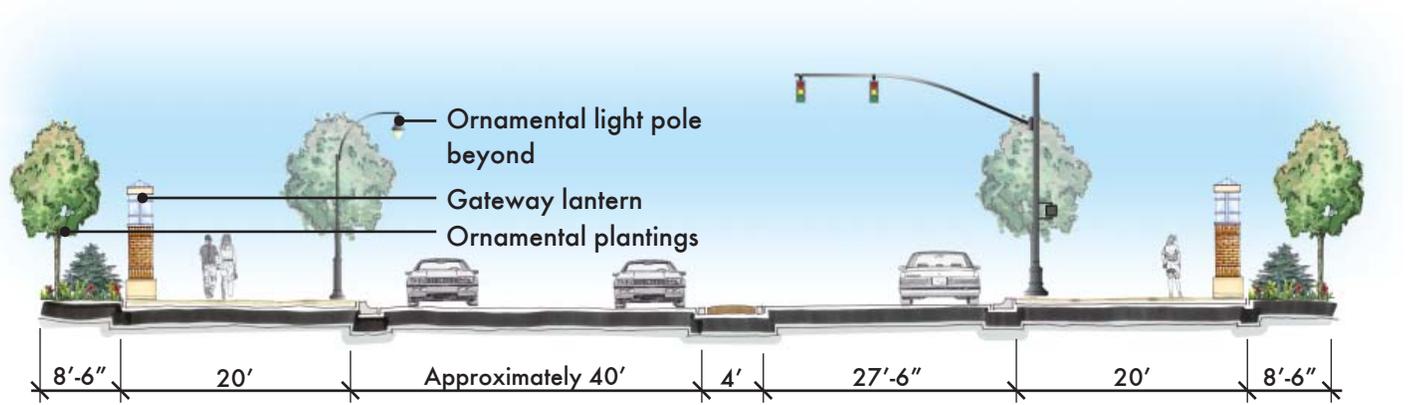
Typical cross-section illustrating the application of gateway lanterns at primary intersections. The gateway lanterns are used to further announce the intersections and provide a front door to specific communities within the town.
